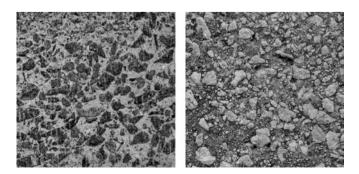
Detailed photographs illustrating the two different types of aggregate (trap rock and marble) used within the same cement binder to provide aesthetic character to the exterior walls and trim of the reinforced-concrete structure. The dome material was similar to the sample at right, but with a finer marble aggregate, rock flour, and crushed glass that provided a smoother, uniform finish with sparkle. Photo courtesy of JGWA.
